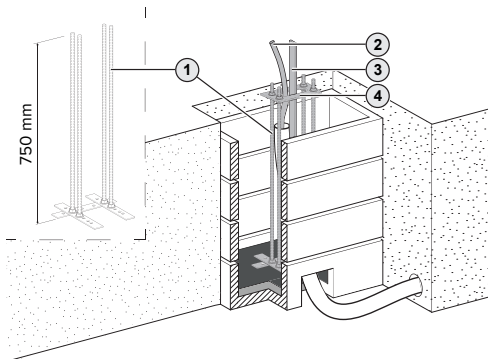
Insert the foundation fixing set including the foundation plate (example: AMEDIO)
